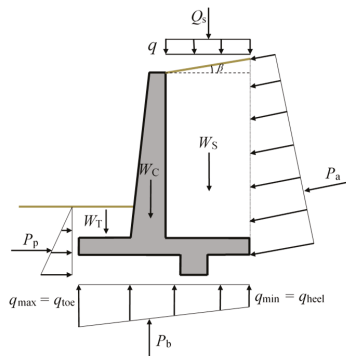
Forces acting on the retaining wall (redesigned based on [6]).
